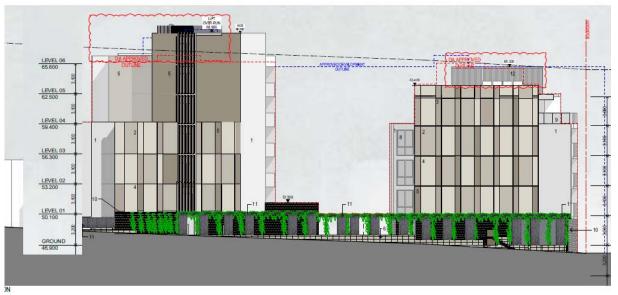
Proposed eastern elevation (proposed changes clouded in red)
